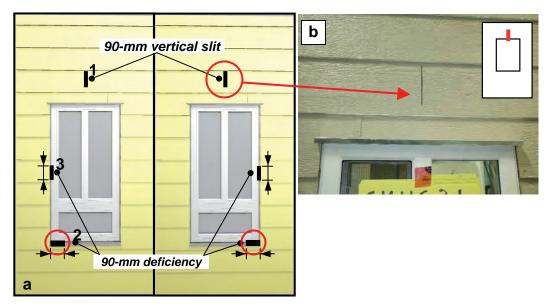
(a) Schematic of front elevation of 2.44-m by 2.44-m specimen (cladding exterior) showing nominal location of 90-mm deficiencies (missing sealant, backer rod at specimen face); (b) picture of 90-mm slit located above window of Specimen W3 – icon relates to test Trial description.
